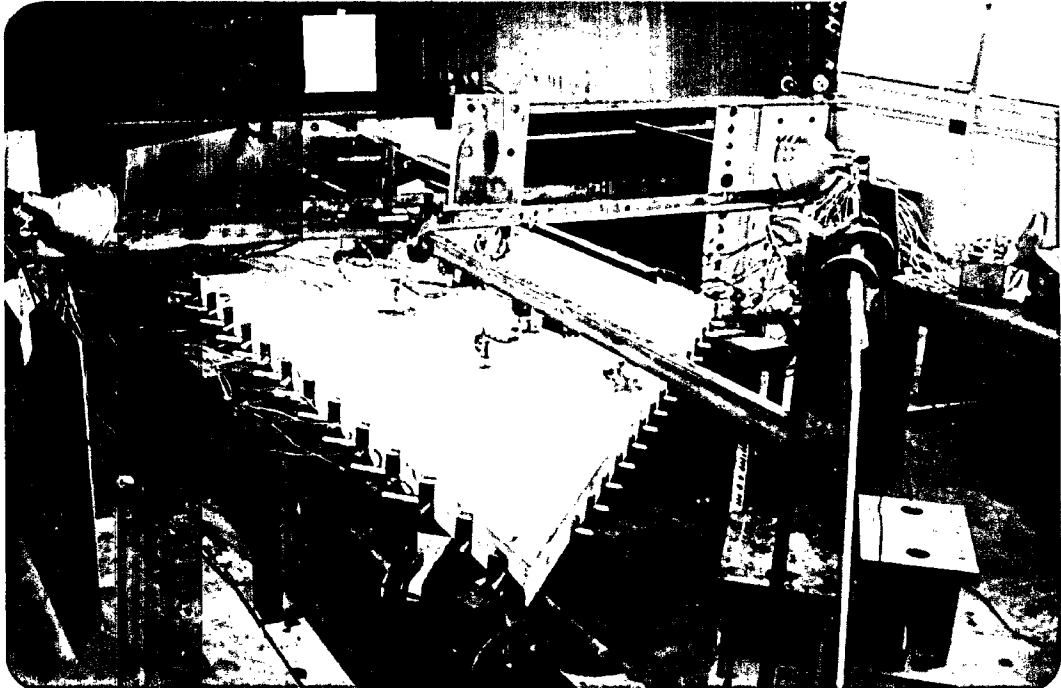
LOADING SYSTEM FOR PRESTRESSED SKEW SLAB B.2.
